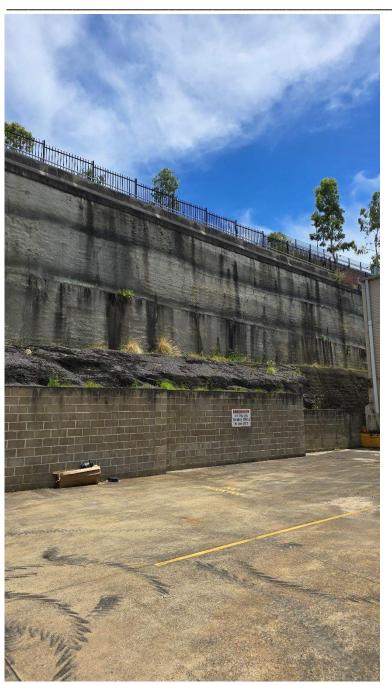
Cracks observed (46, 47, 48, 49) - Retaining wall exhibited signs of horizontal surface cracking
